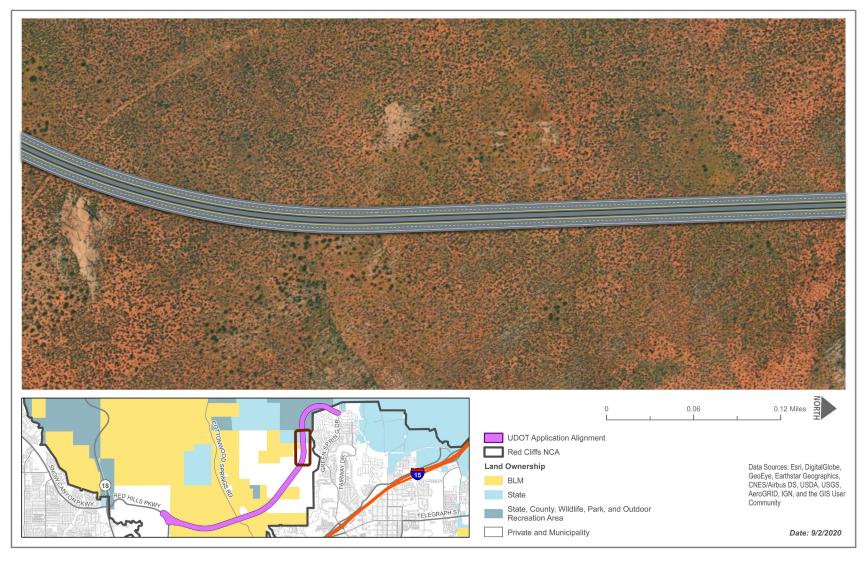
UDOT Application Alignment Plan View (7 of 9)
